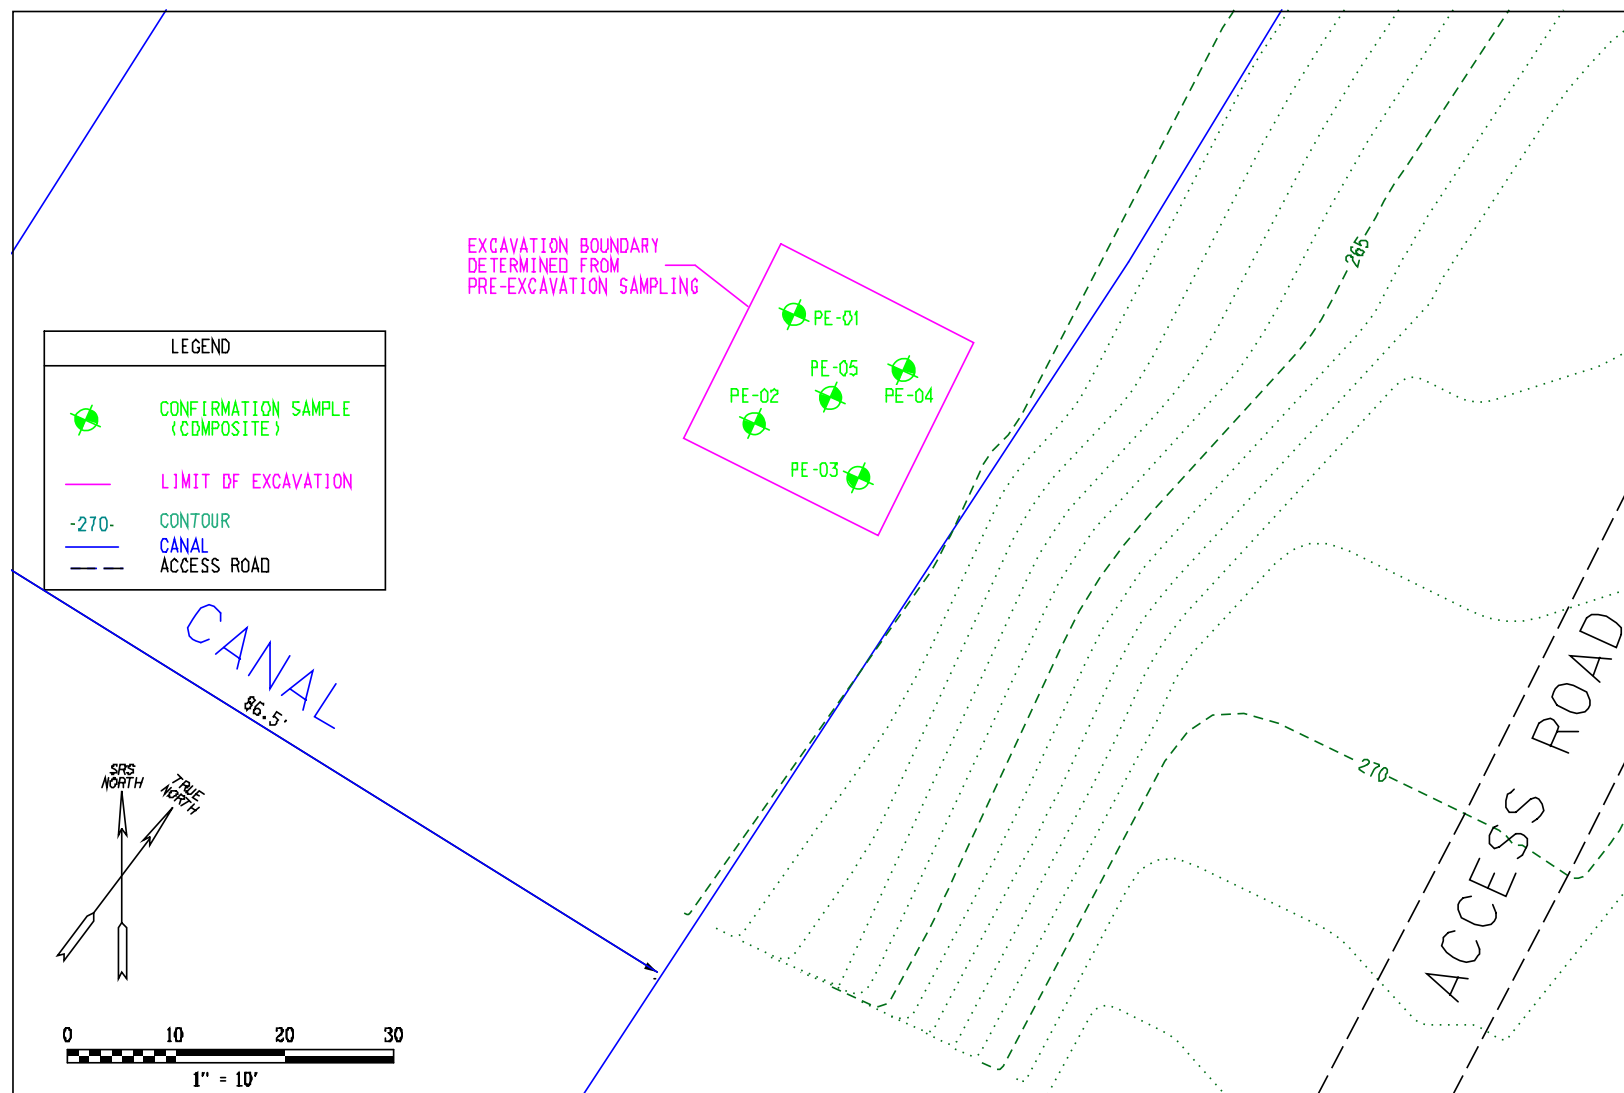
Post Excavation Sample Locations to Confirm PTSM has been Excavated
